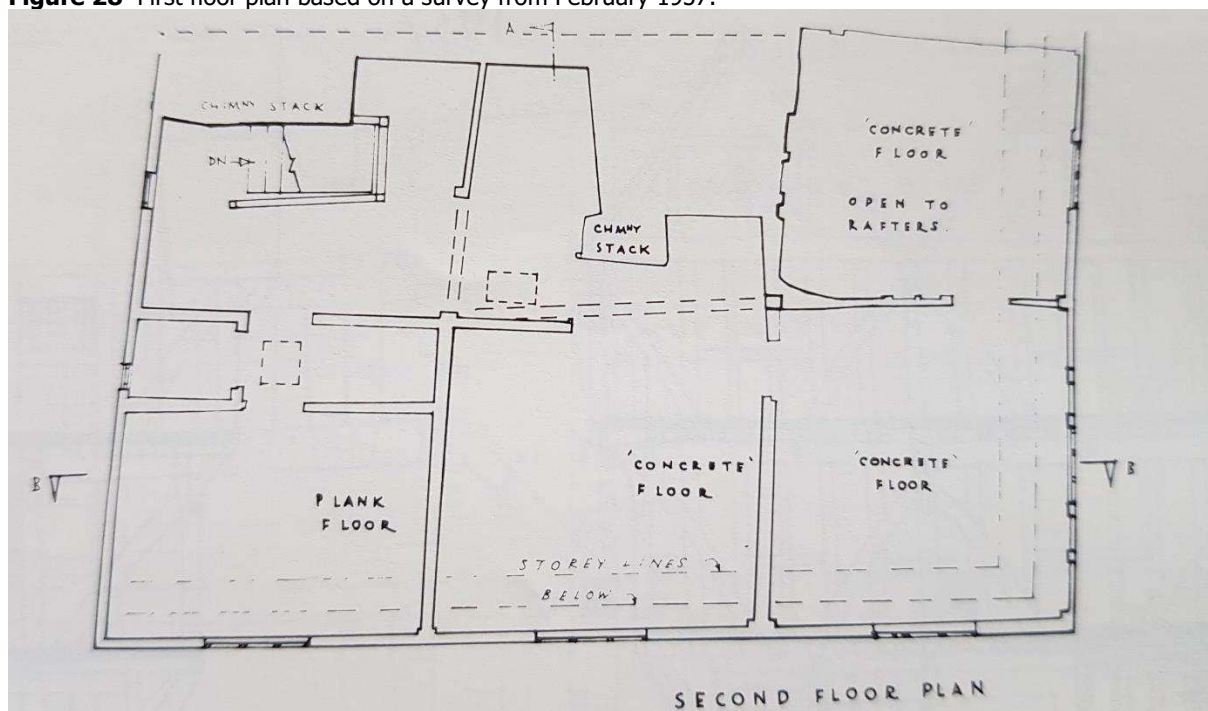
Second floor plan based on a survey from February 1957.⁶⁵
